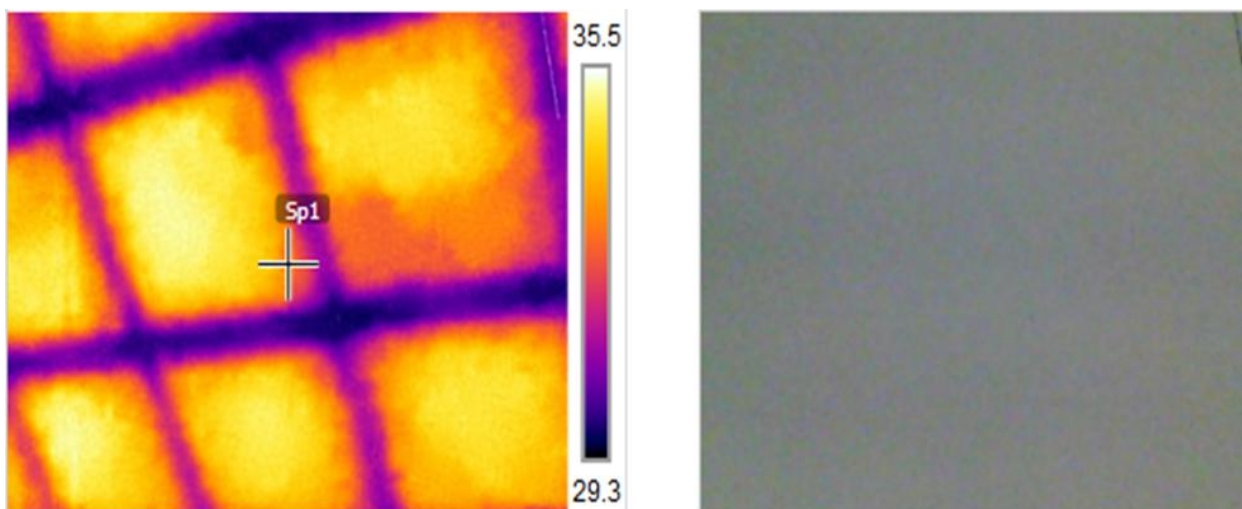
Poor Heat Insulation of Ceilings of Top Floor Rooms
